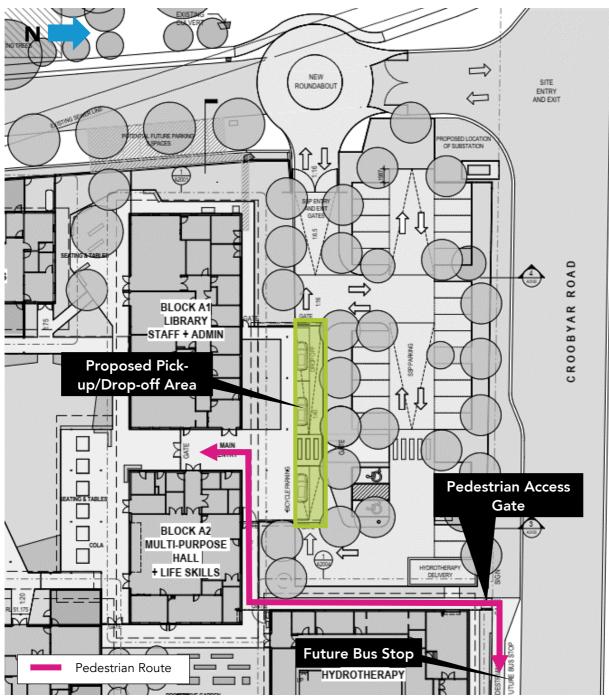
Proposed Site Layout – Site Plan, Drawing No. A2000, Issue J (Source: GroupGSA)
